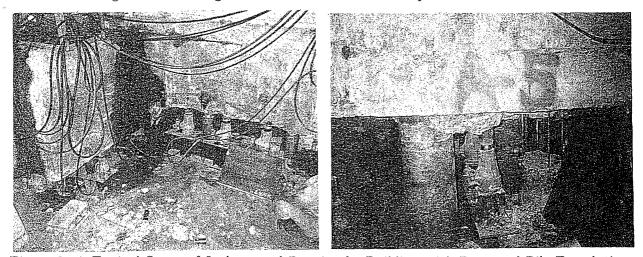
A Typical Scene of Jack-up and Repair of a Building with Damaged Pile Foundation
